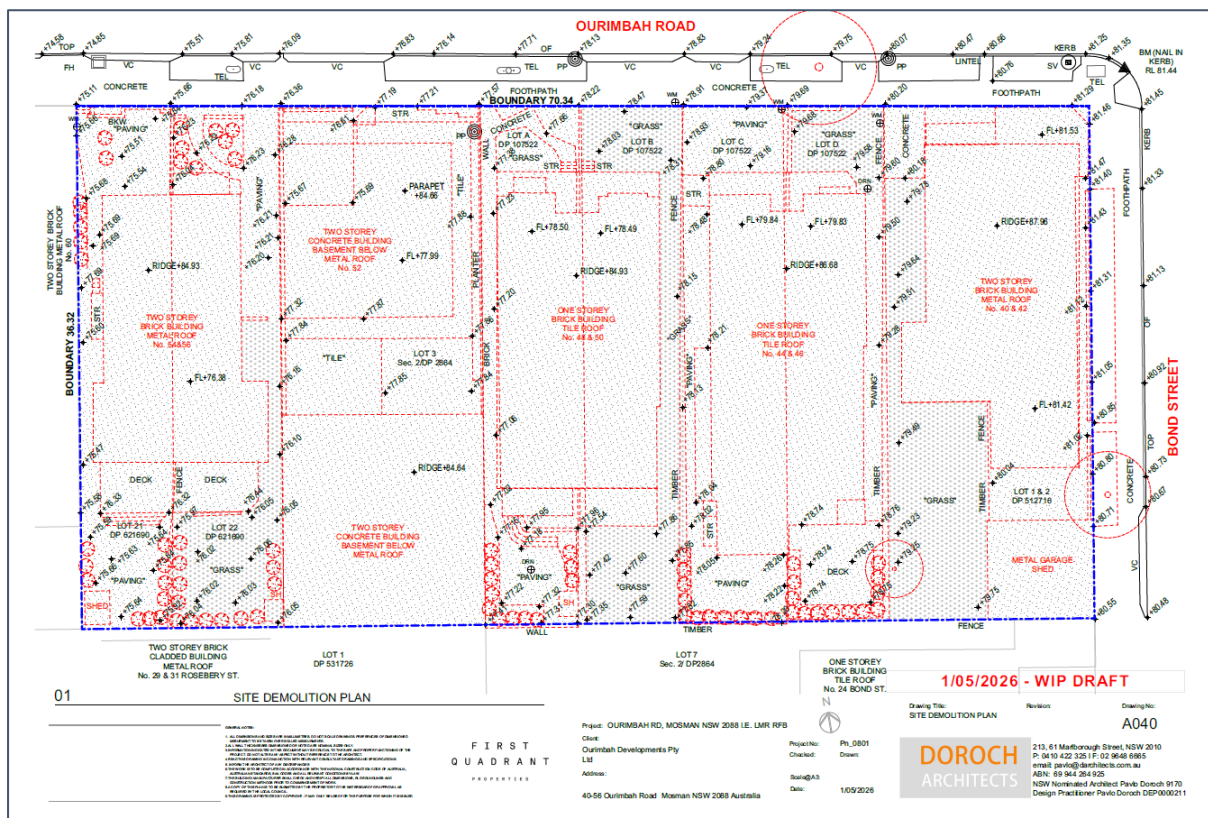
Proposed demolition plan (Source: Doroch Architects)
